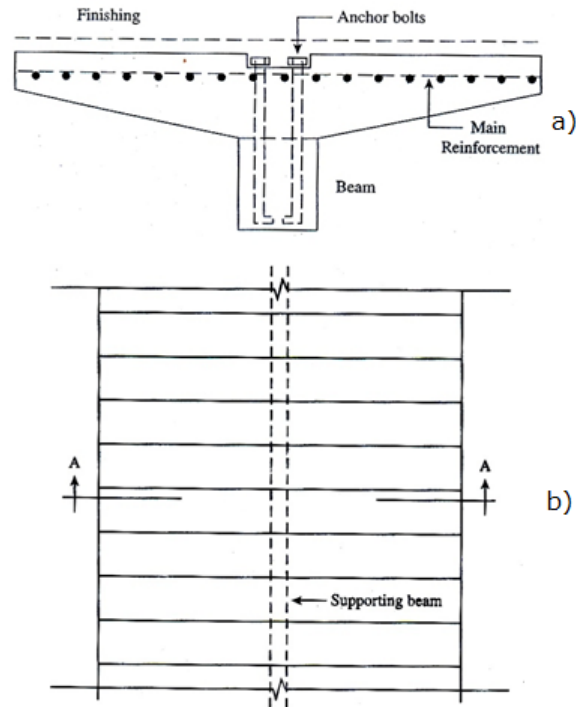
Precast cantilever stair supported by central beam (a)section A-A (b) Plan
